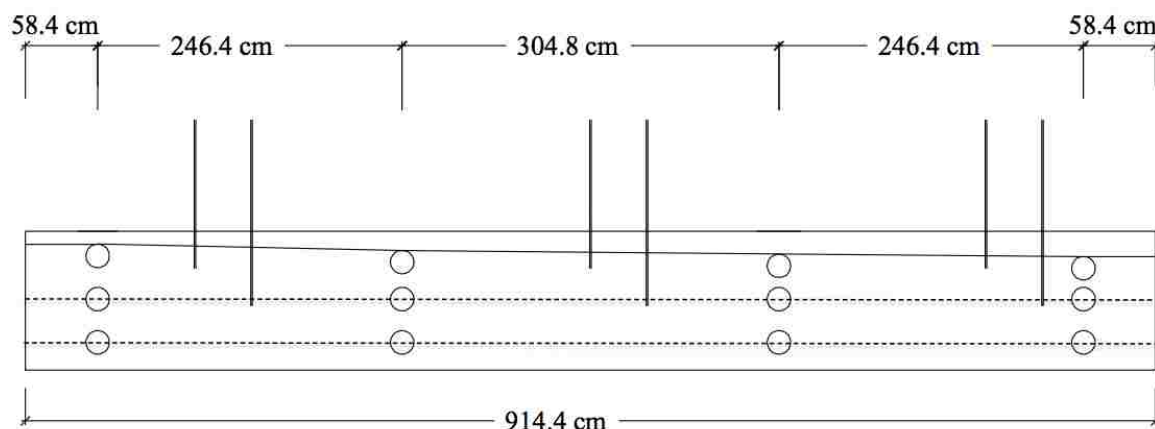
Extraction points of concrete cores for 9 m long beam.
